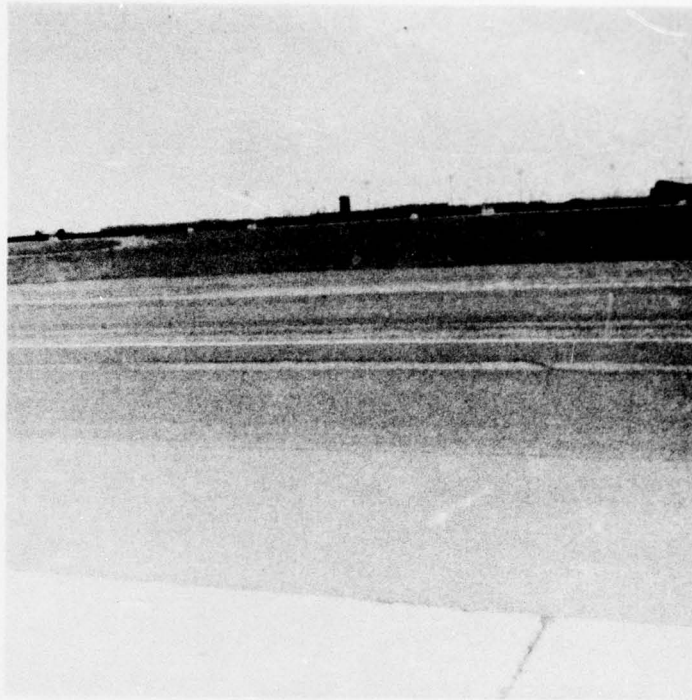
General view of AC pavement of outer edge of runway interior (feature R8D) near sta 45+00
